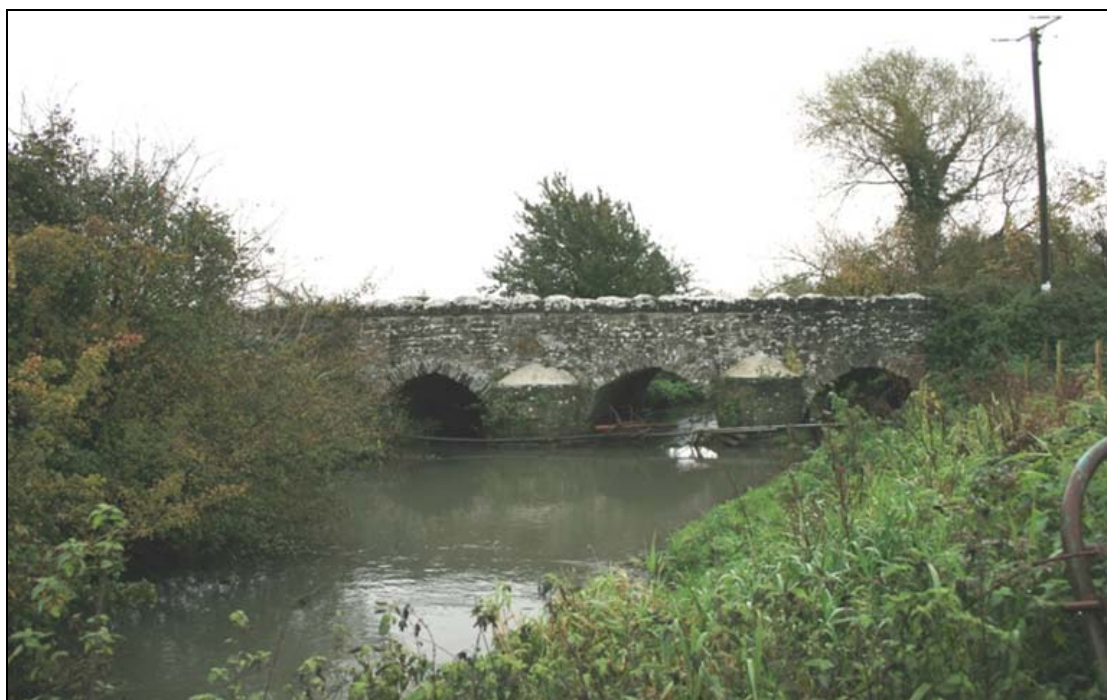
West upstream elevation of Chapelmidway Bridge (Photo Reference: FHBS-12-BH-01)
